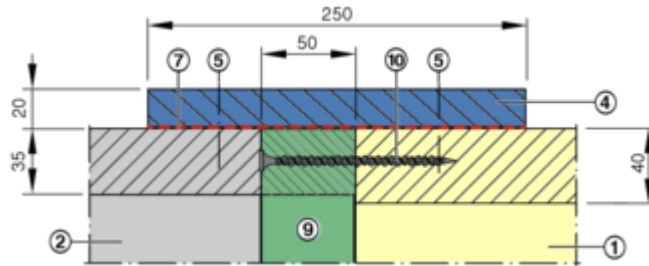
Installation detail B1: Connecting subframe on operating side (flush outside)
